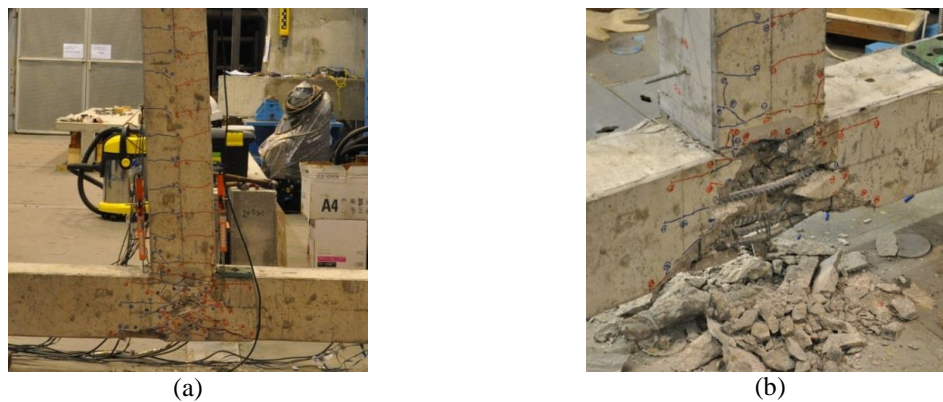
Failure mode of specimen JC0: (a) diagonal cracking of joint core and (b) buckling of column reinforcements
